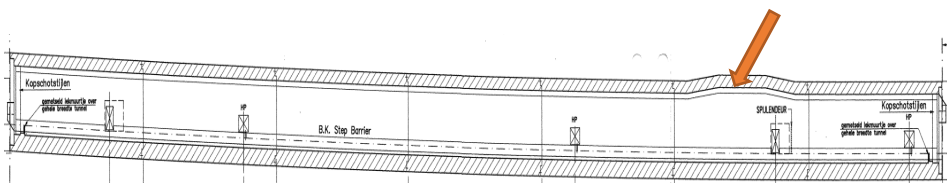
Longitudinal section on tunnel element 4. The orange arrow marks the location where the cores are taken.
